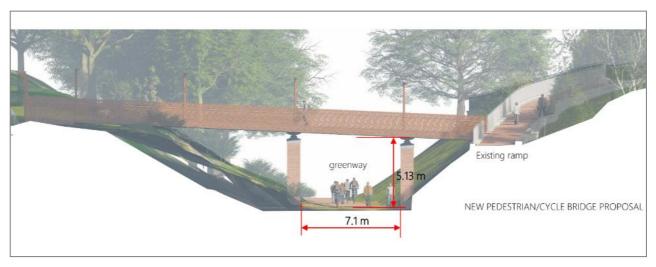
Cross-section of proposed bridge by Shipsey Barry Architects
